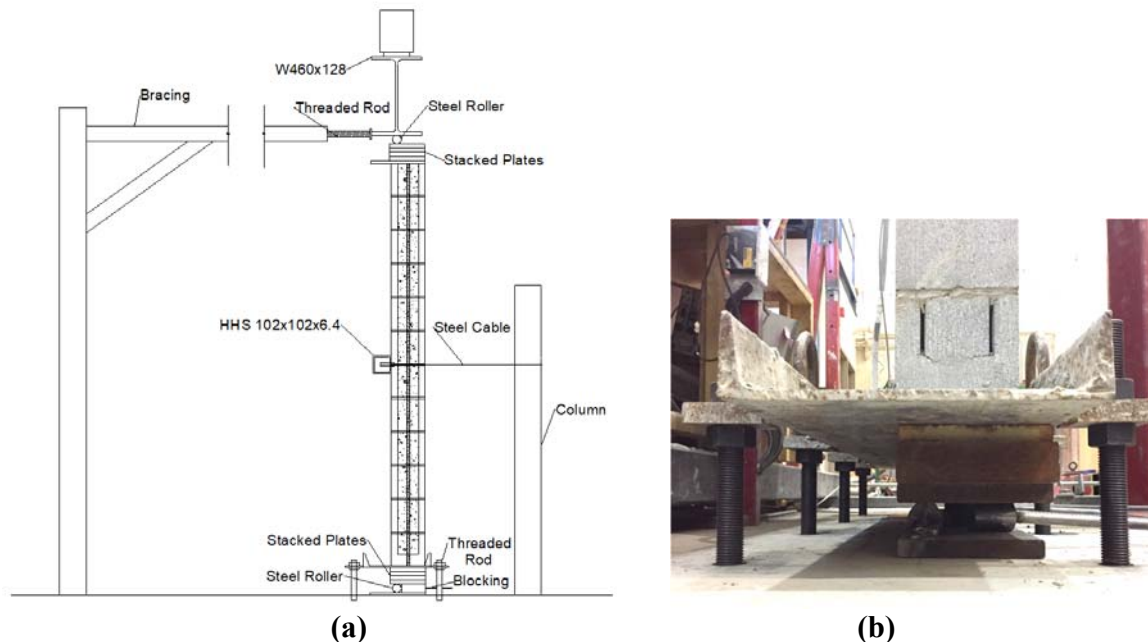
(a) Vertical Section of Wall with Pinned - Fixed Supports and (b) Base Detail
